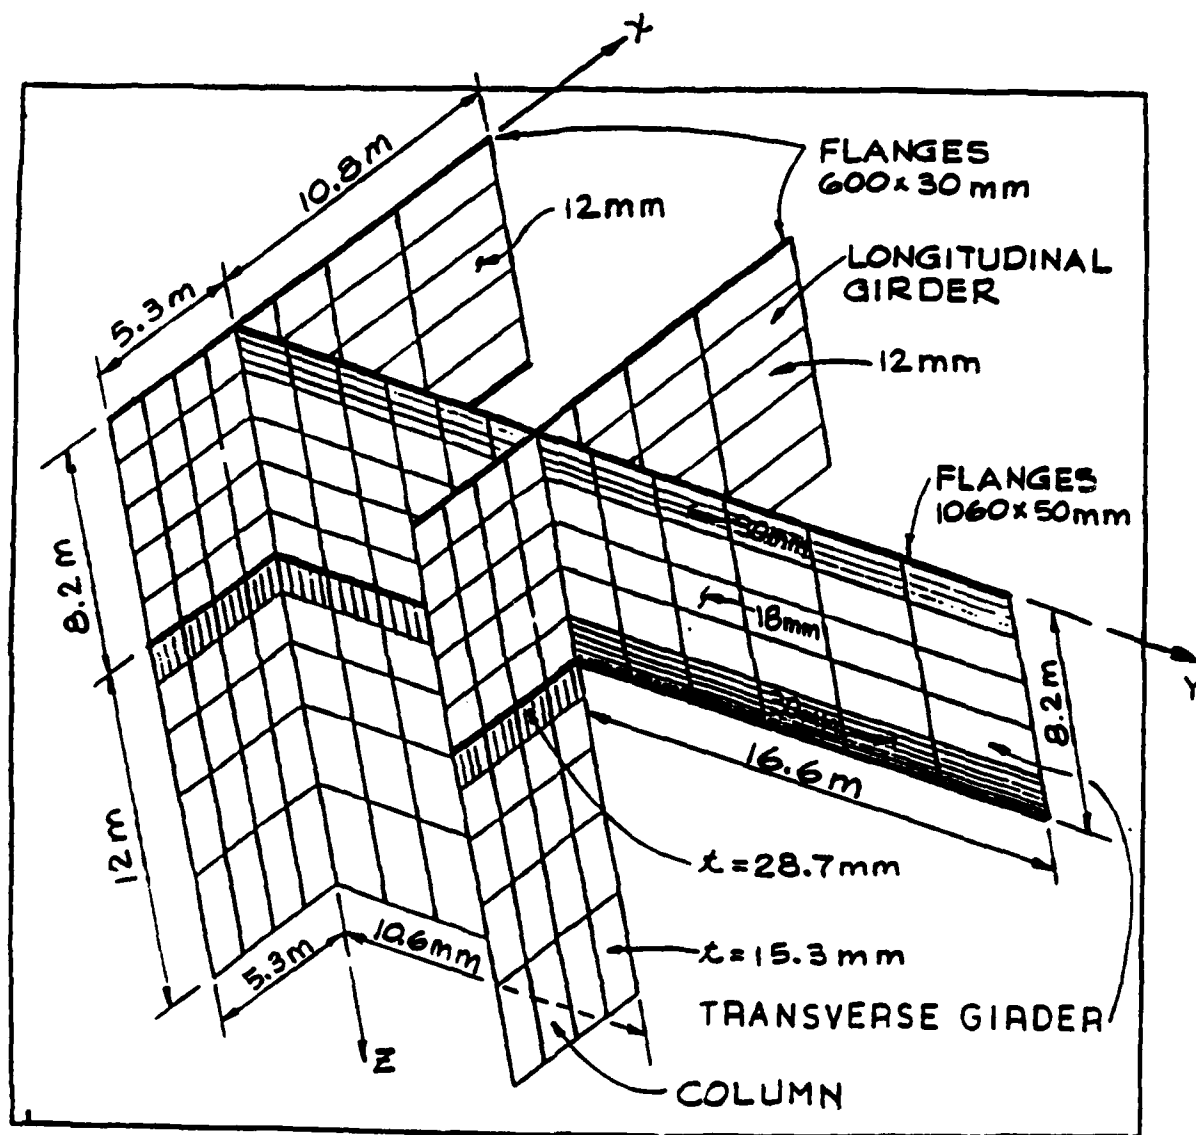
Finite Element Model and Dimensions of Column-to-Girder Connection
